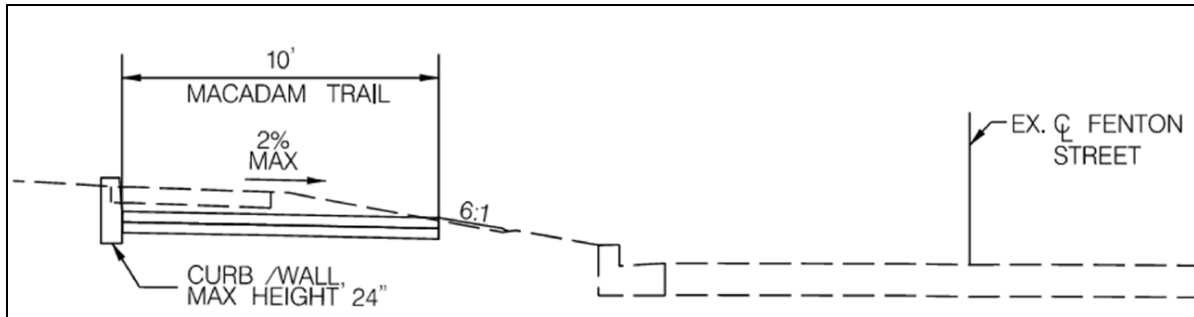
Proposed Cross Section of Trail Spur – Looking North
